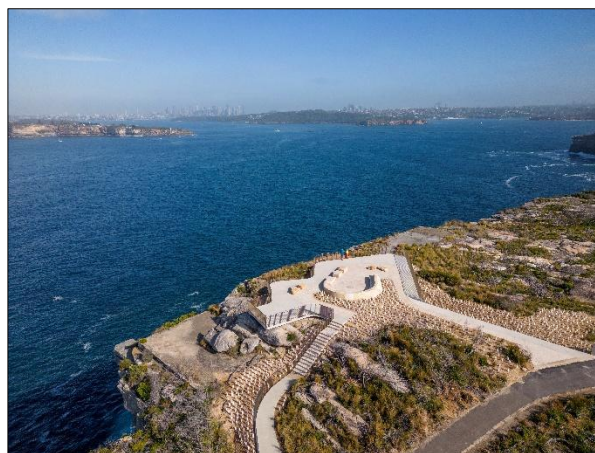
Lookout One following construction (looking south-west, image courtesy of NPWS, 2023)
